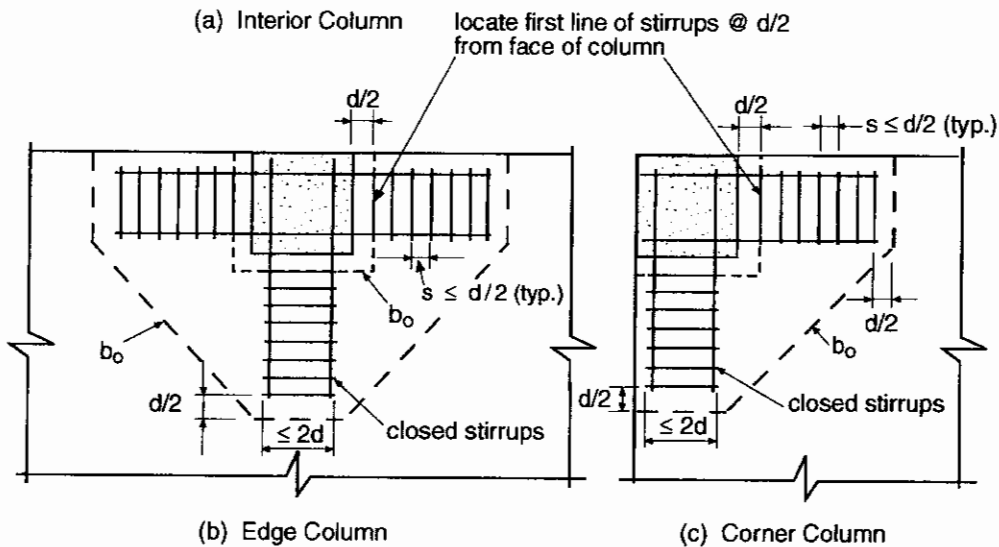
Design and Detailing Criteria for Slabs with Stirrups
